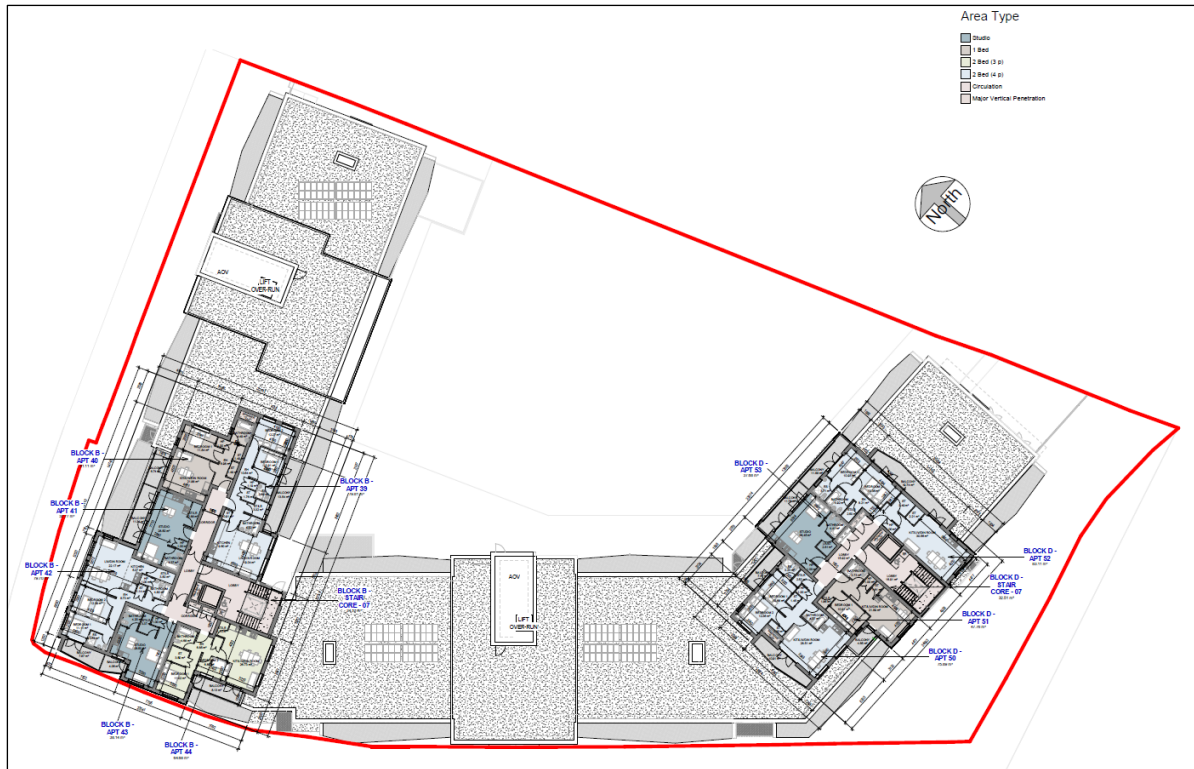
Seventh floor plan of development approved under ABP Ref. No. 303803-19
